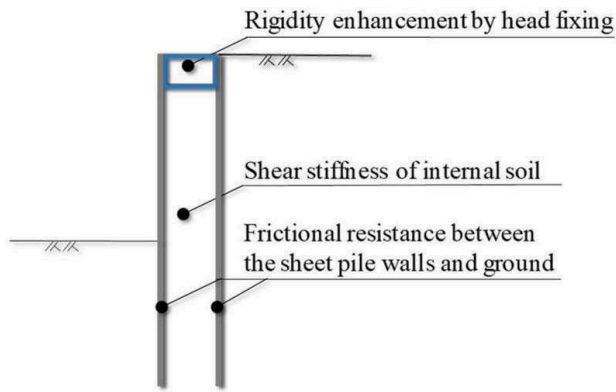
The concept of temporary earth retaining by the double sheet pile walls.
